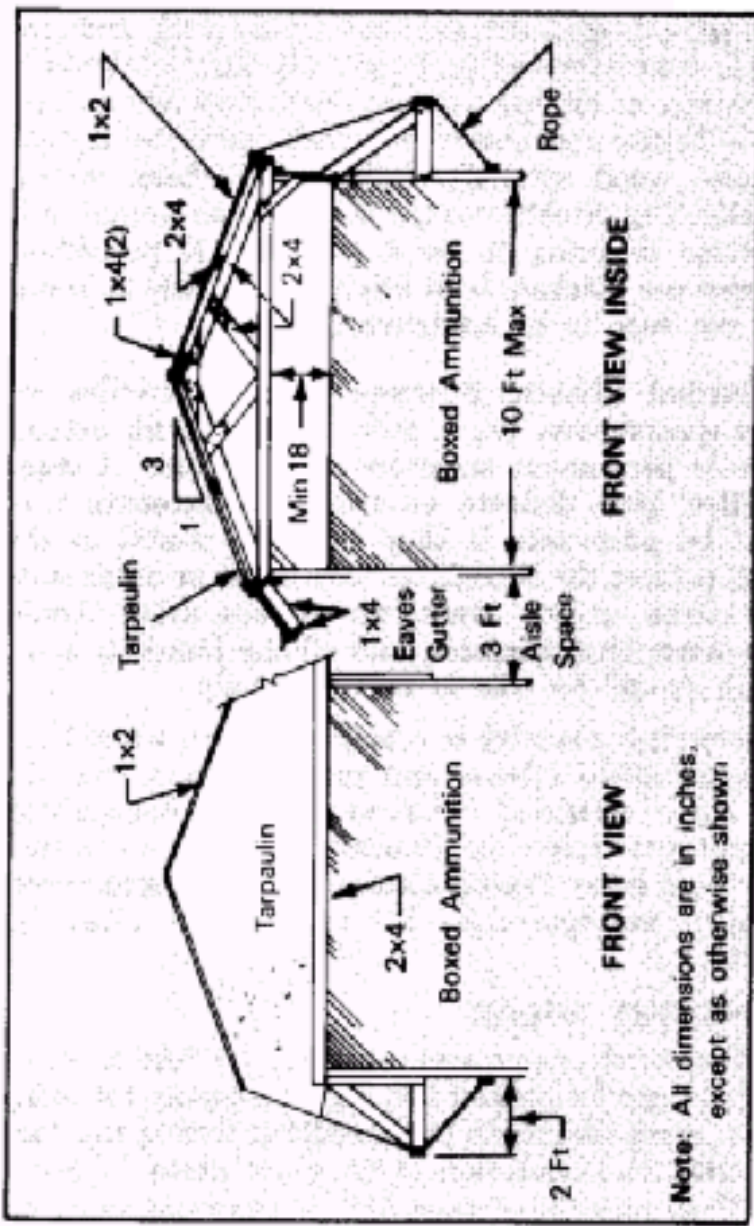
Cross Section Details of an A-Frame Ammunition Storage Module.
